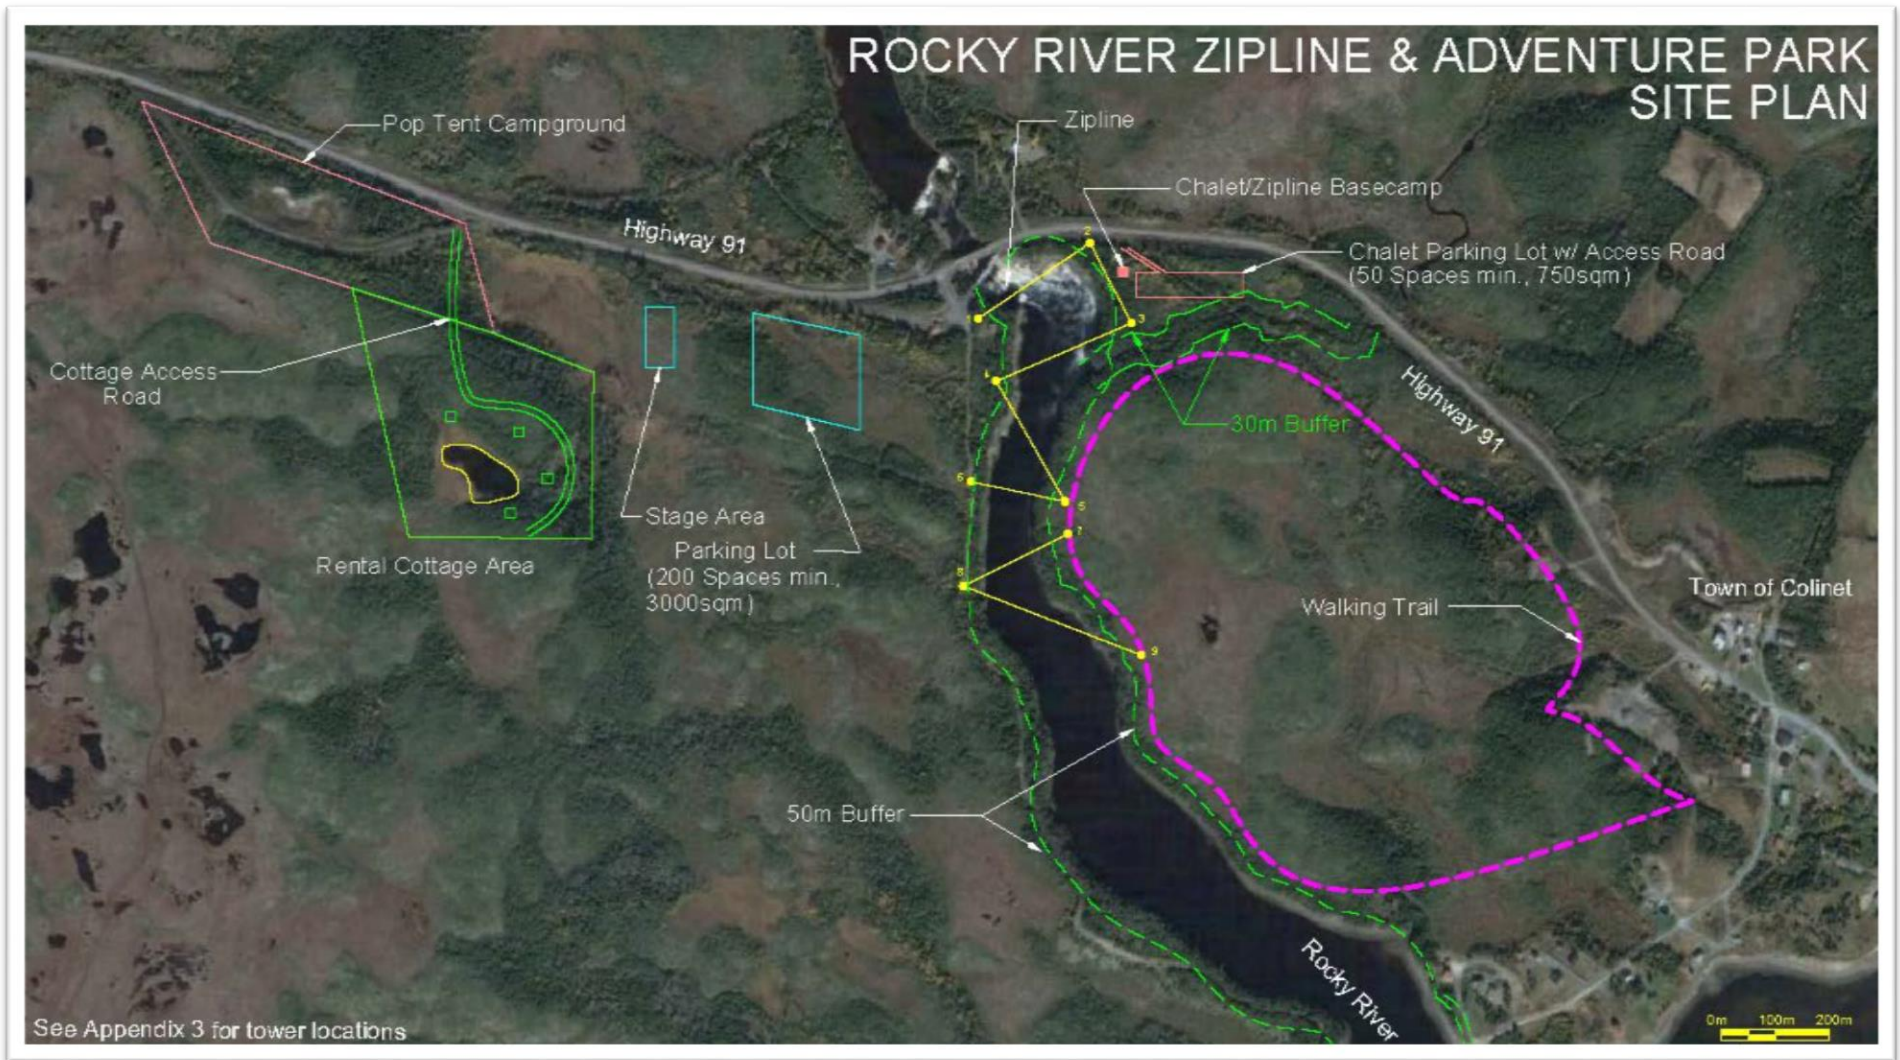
Detailed Site Plan & Layout (see Appendix 1)
